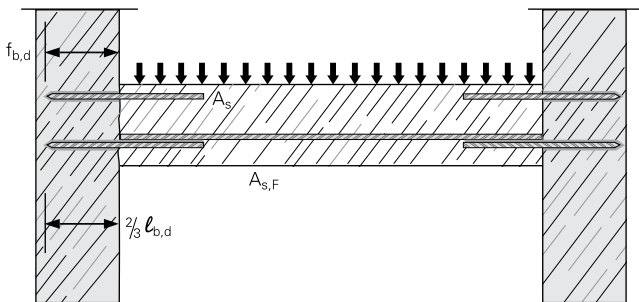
End anchoring of slabs or beams design as simply supported.
